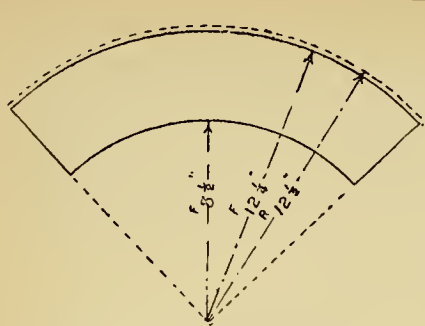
TEMPLATE OR MOULD FOR SEGMENTS OF THIRD LAYER.
